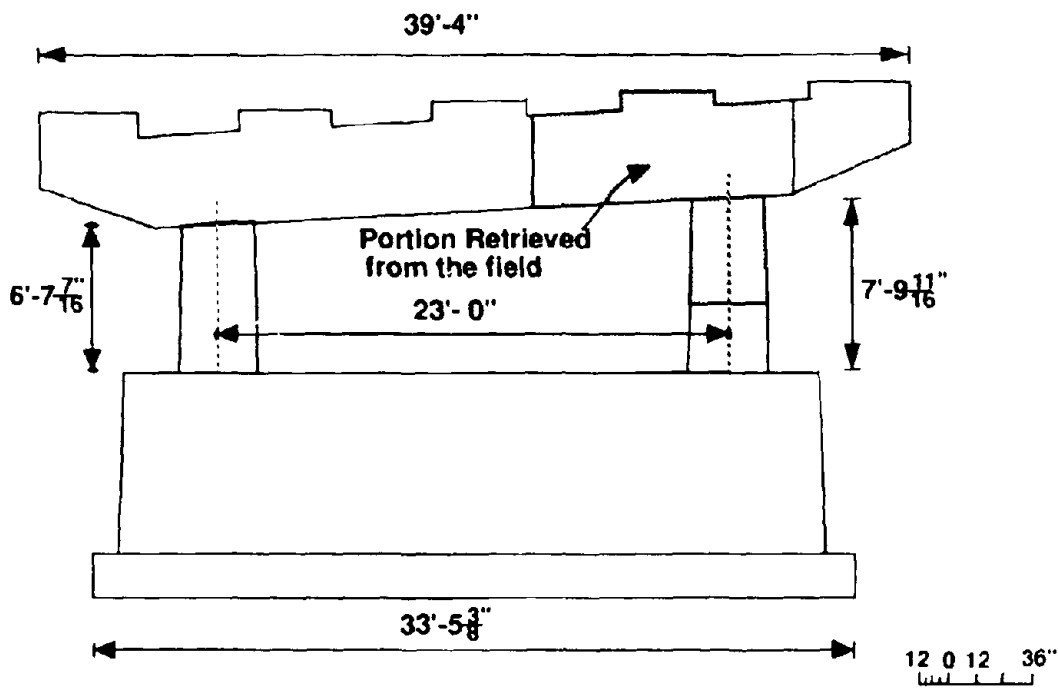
Elevation Showing Location of the Prototype Specimen
